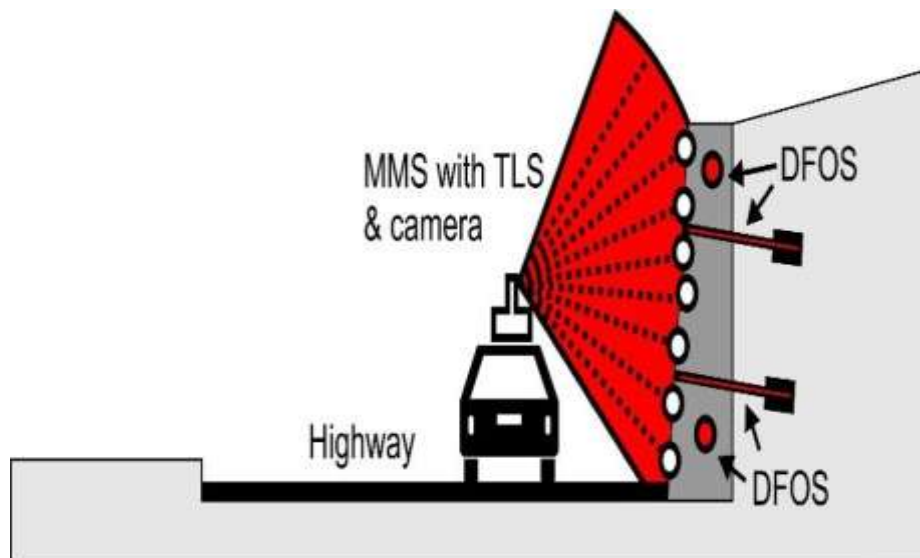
Example of a modern monitoring setup of an anchored retaining wall
